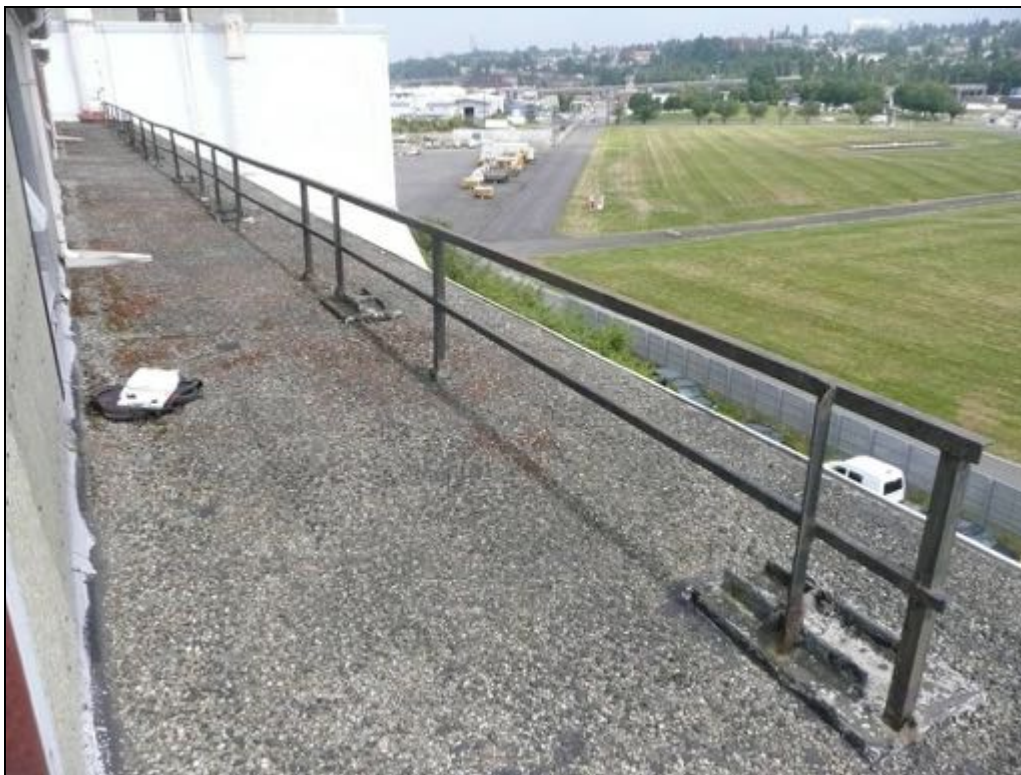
Steel angle railing on the east side of the Boiler Room roof, with steel mounting plates and pitch pockets.
